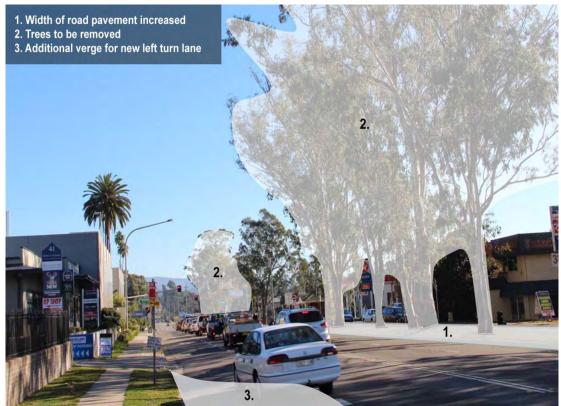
Indicative extent of proposed work as viewed from the Bells Line of Road westbound approach to the Grose Vale Road intersection
